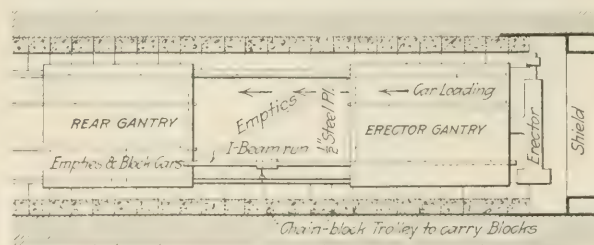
SECTION SHOWING ARRANGEMENTS FOR HANDLING MATERIALS AT TUNNEL FACE
